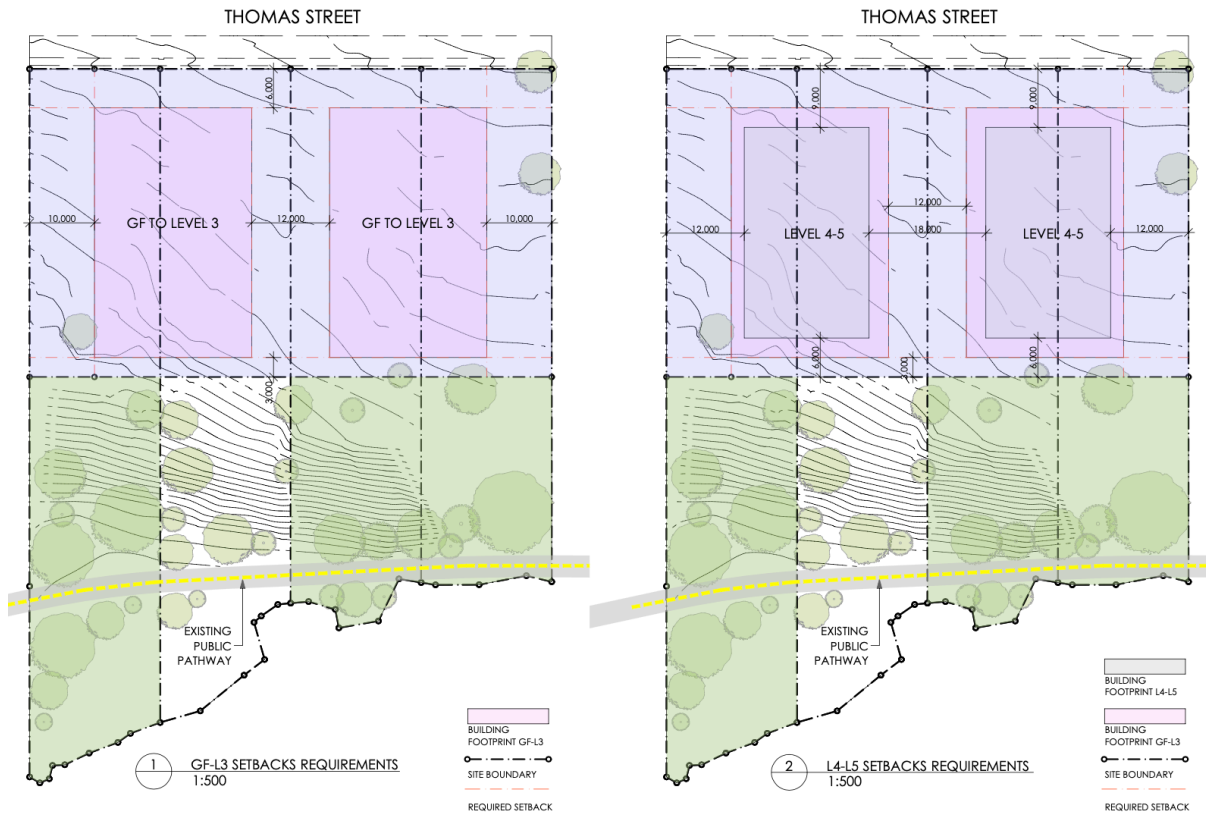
(a) Area 5 Indicative Building Envelopes
